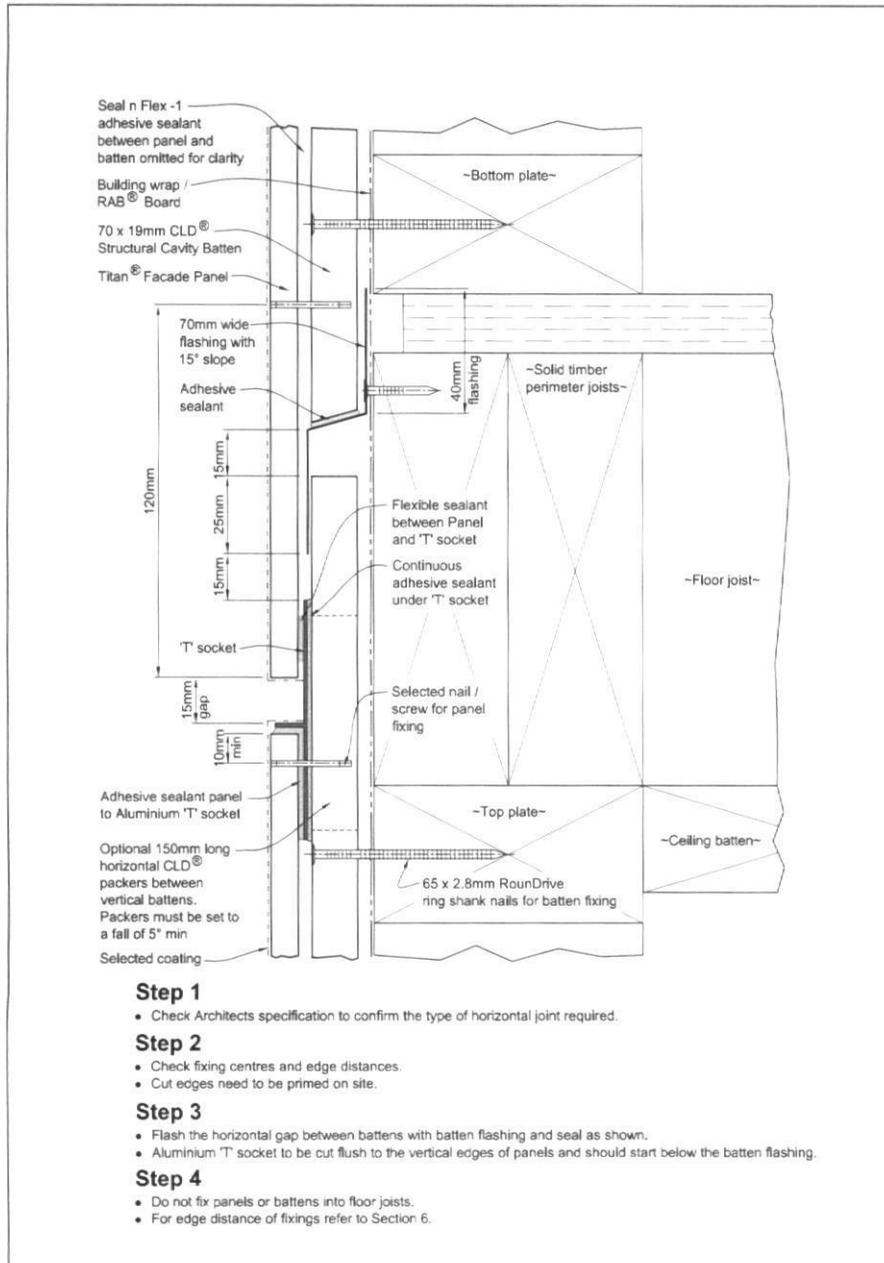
'T' SOCKET JOINT AT FLOOR JOIST
